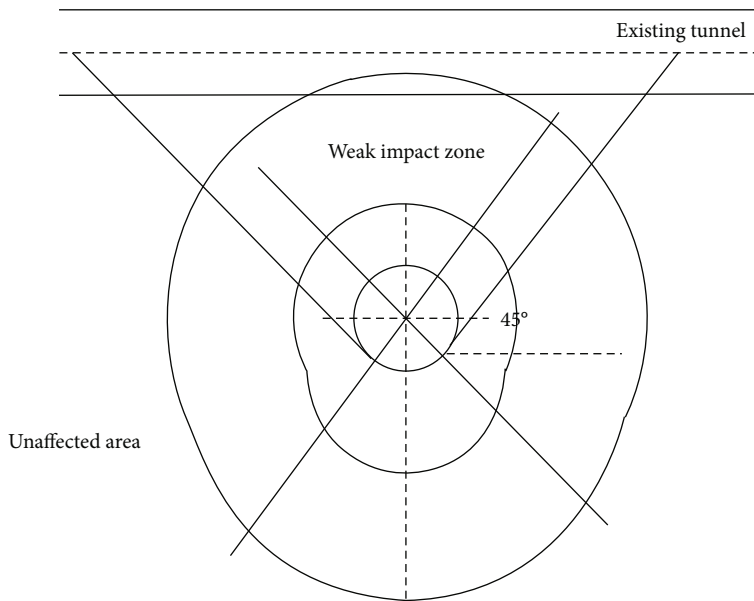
The existing tunnels affected by the construction of new tunnels.
